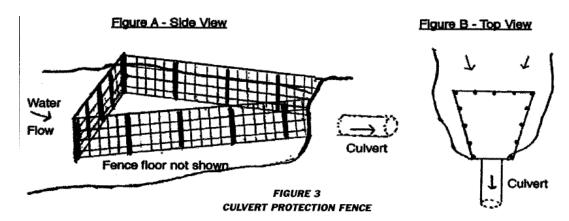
Culvert Protection Fence (Beaver Solutions 2020).
